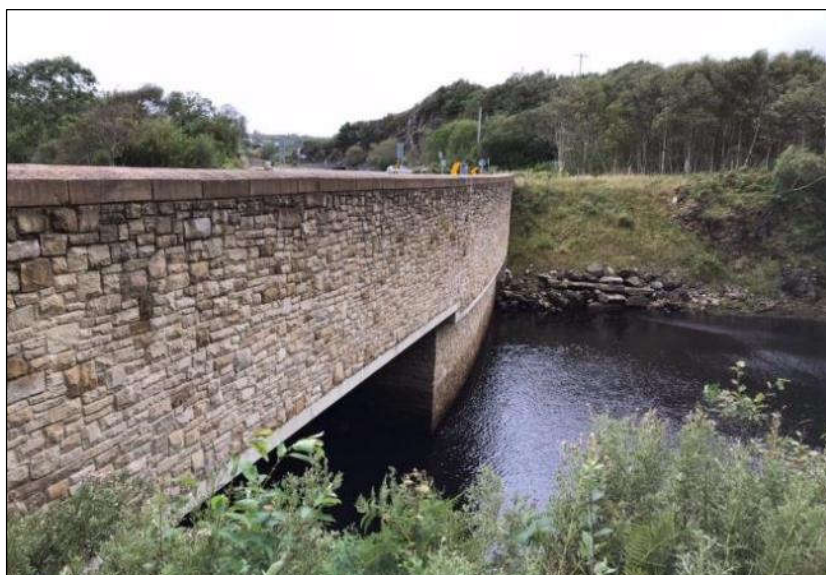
Gweebarra Burn Bridge – concrete slab.
